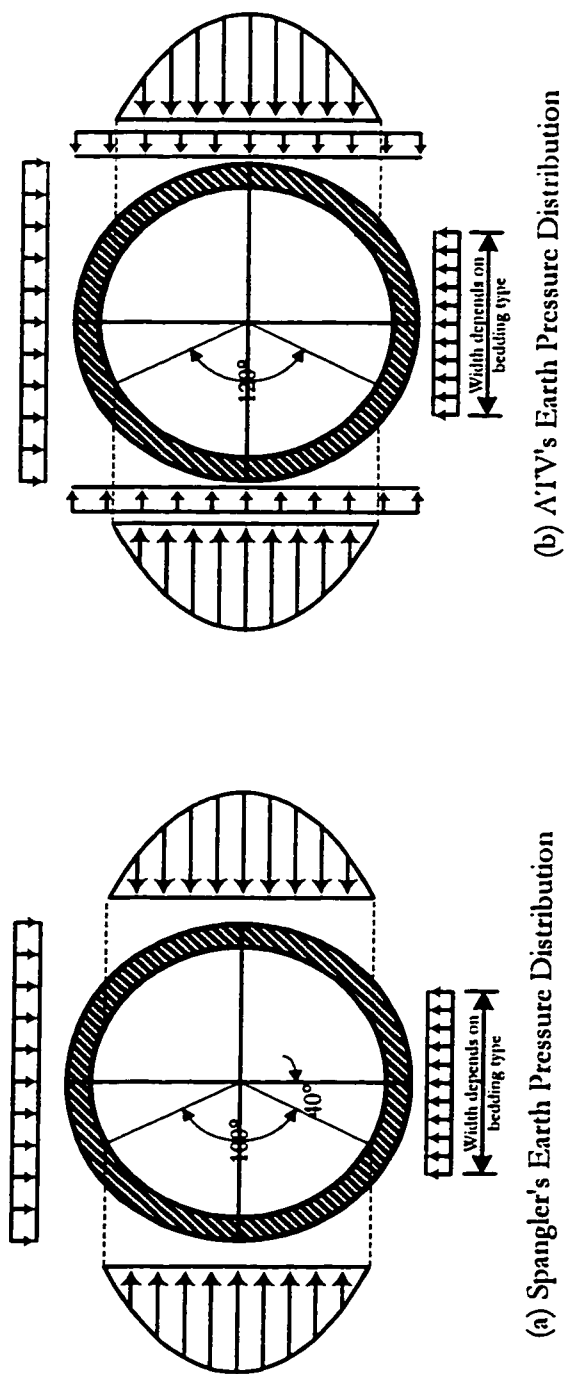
Proposed earth pressure distributions around a flexible pipe
